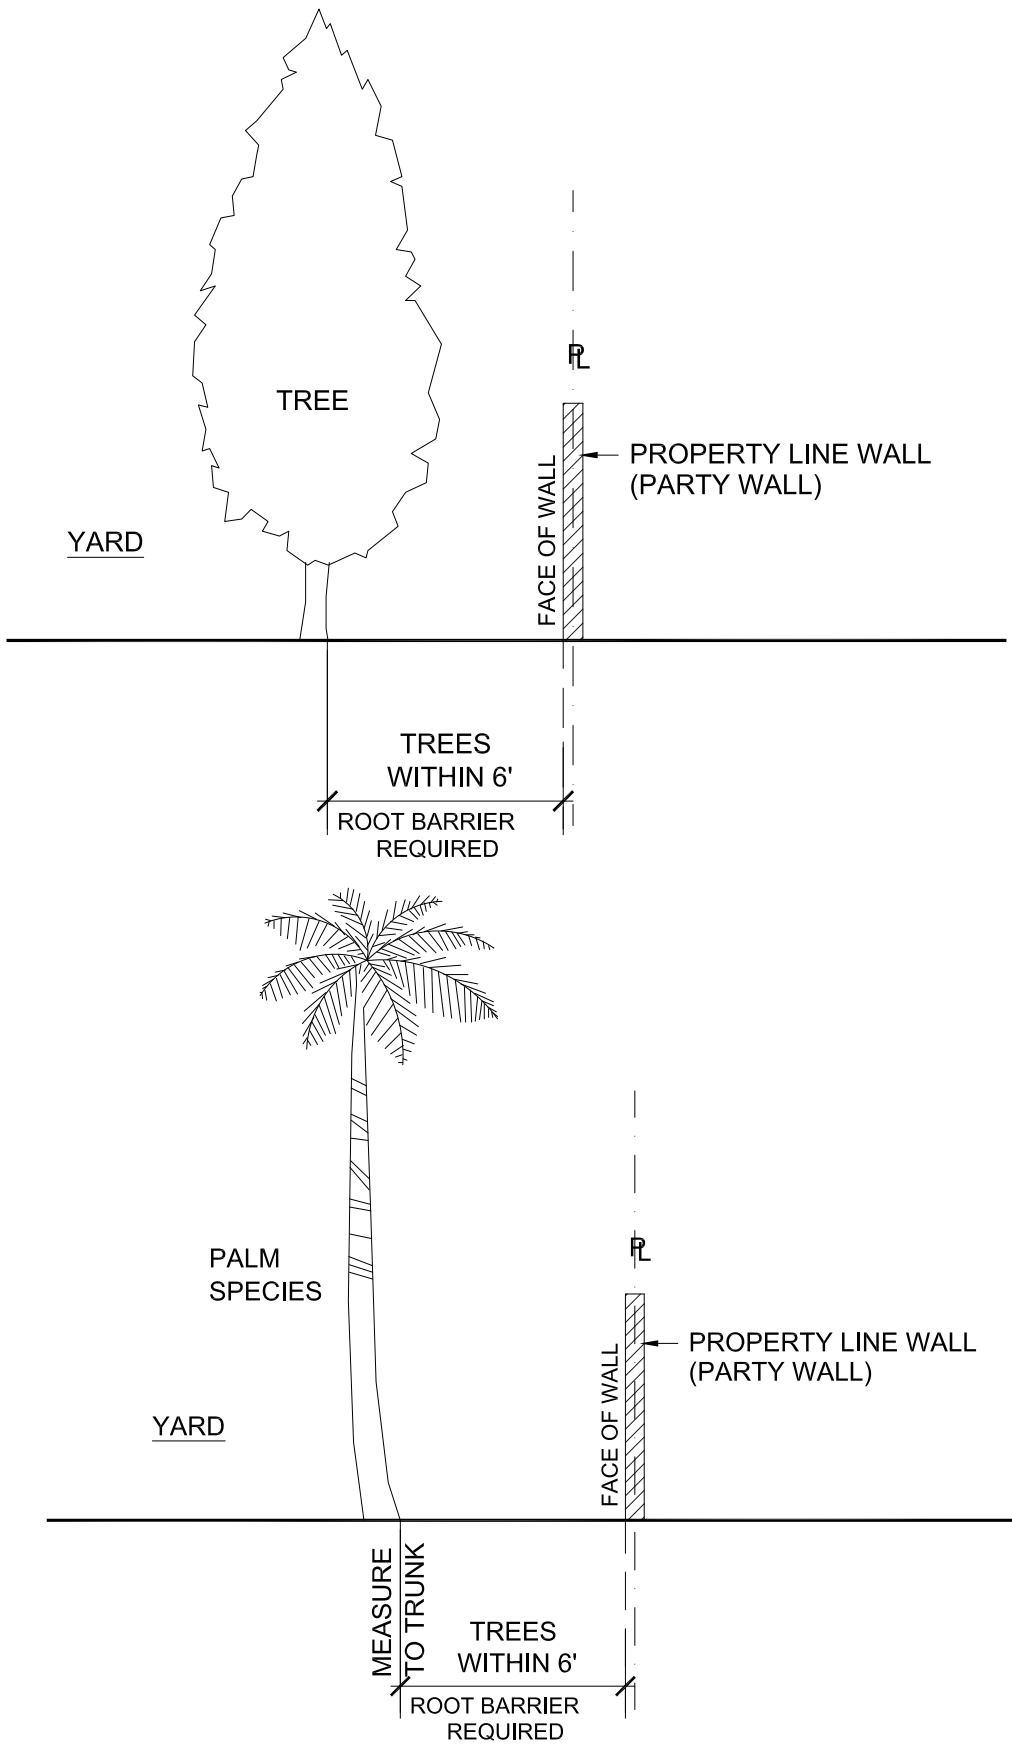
E: ROOT BARRIERS AT HARDSCAPE
